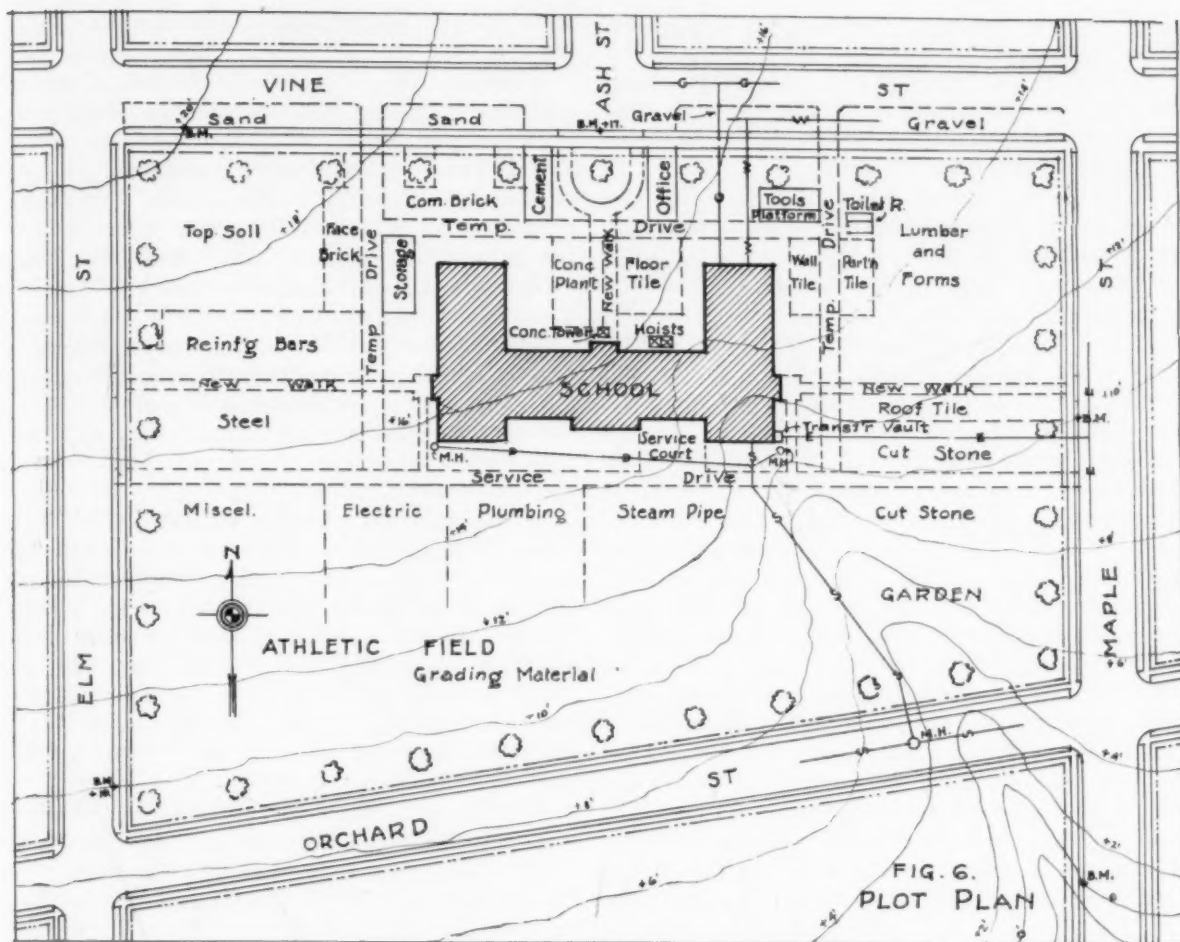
Plot Plan Showing Disposition of Building Materials on the Site
